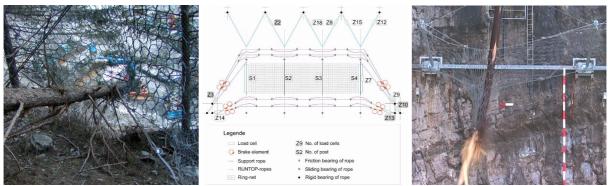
Tree Fall: Hazard in reality (left), drawing of tested system (center) and impact test in Walenstadt (right)
